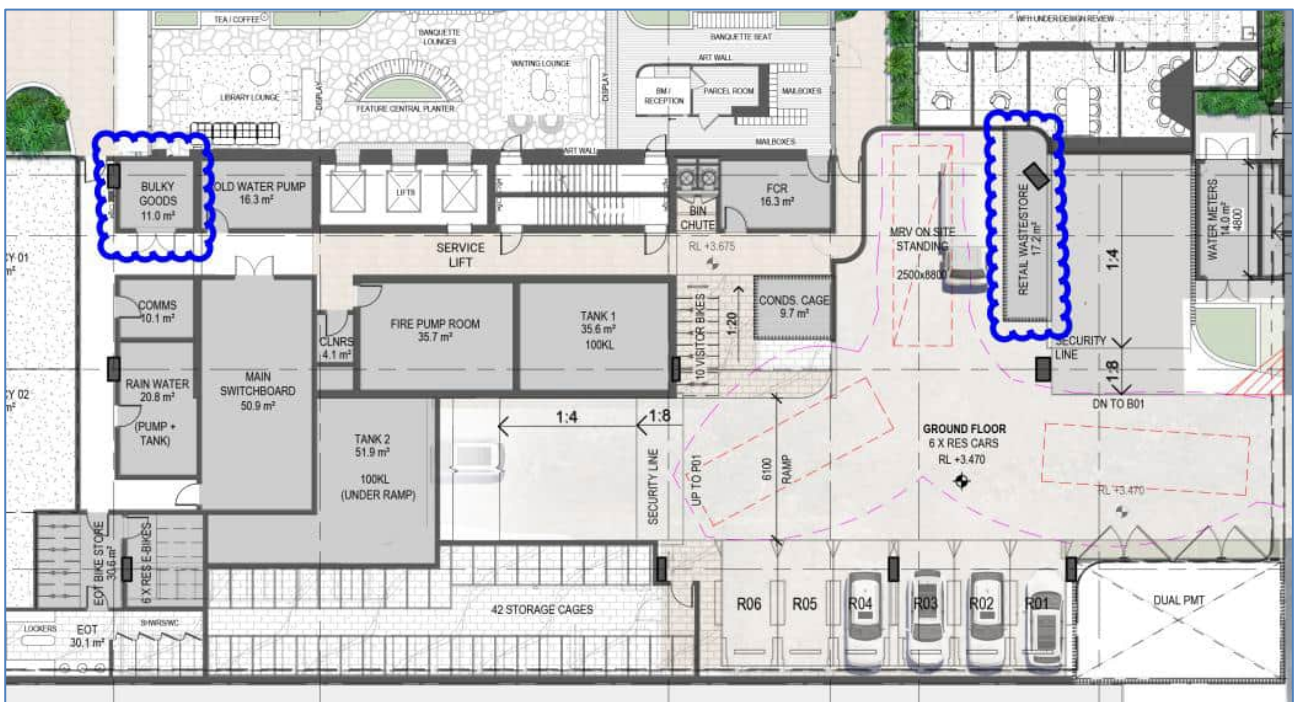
Ground Floor Non-AWCS Refuse Room
